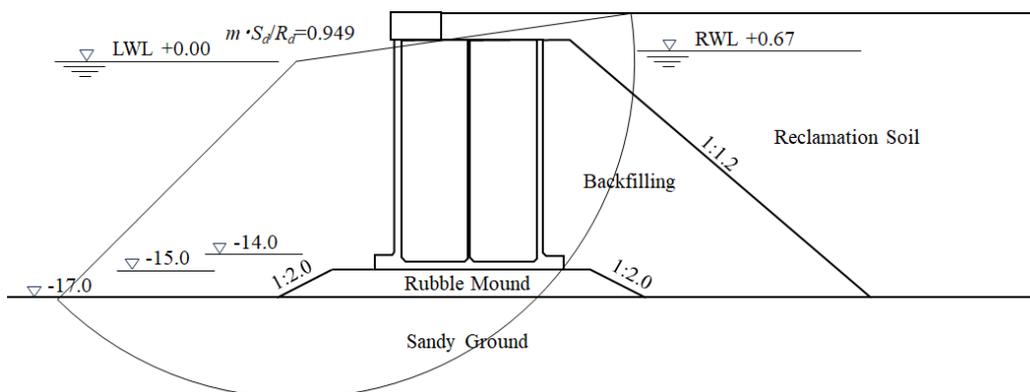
Verification of Circular Slip Failure Stability of Foundation Ground (Permanent State, with Surcharge)
